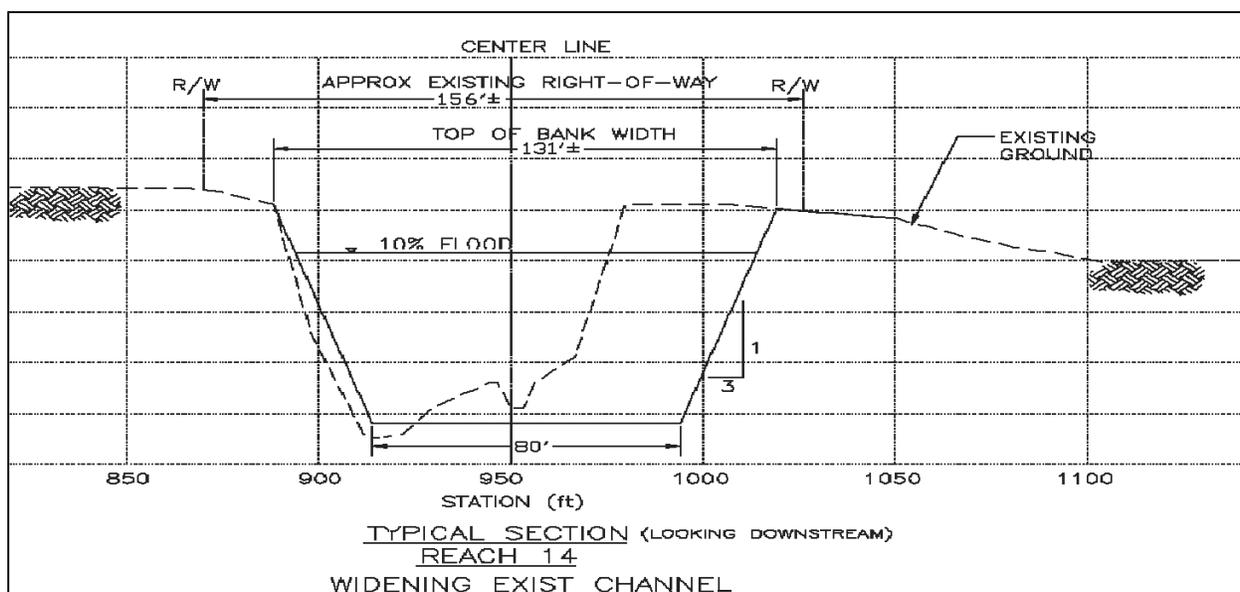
Reach 14 Typical Cross Section for the Reach 6 Bypass Alternative
